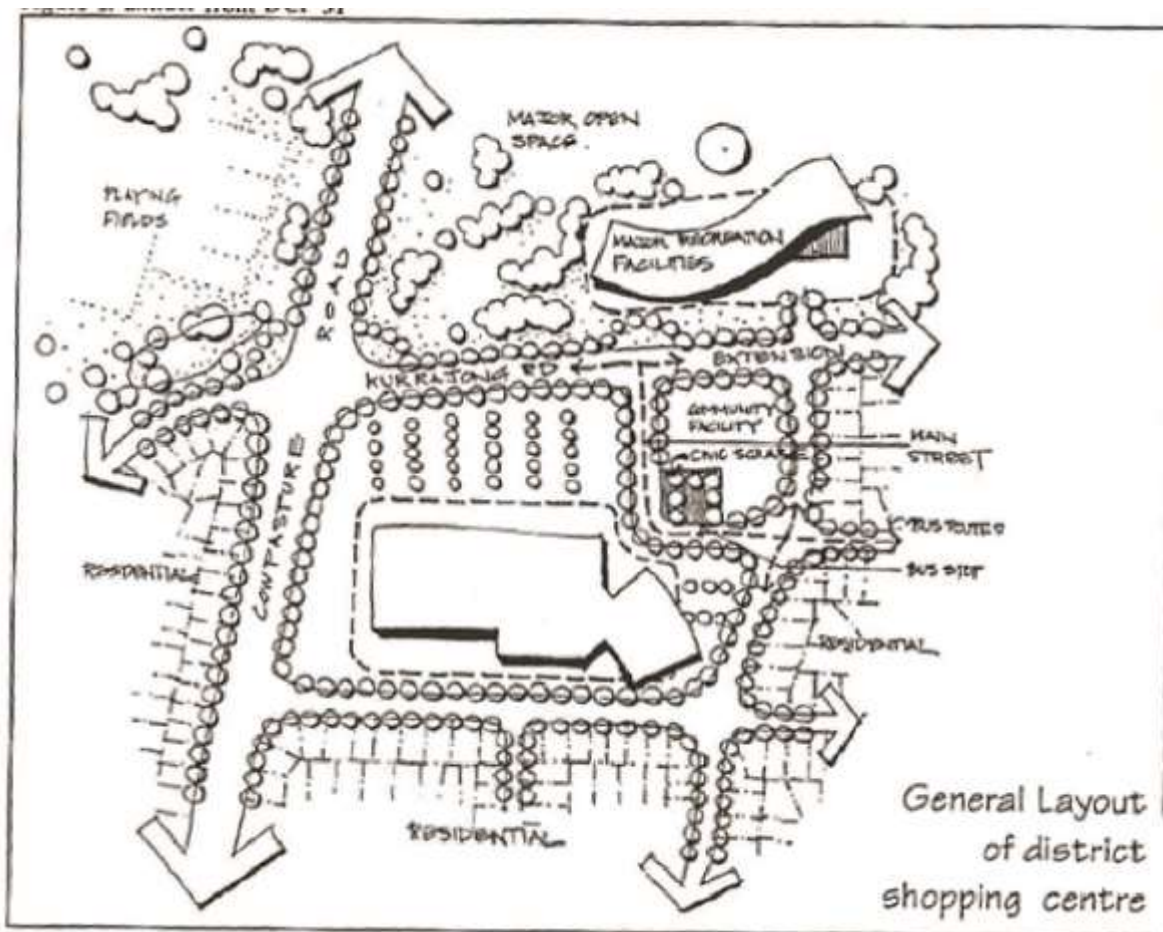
DCP 31 - Proposed Town Centre Plan (Source: Liverpool Council)
